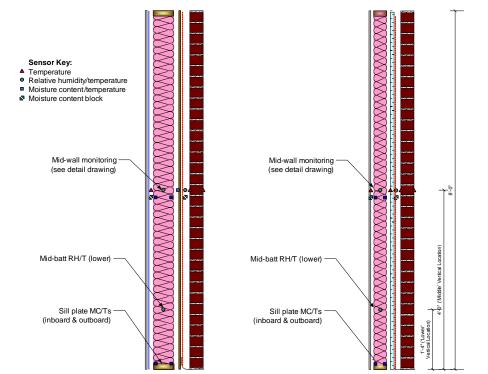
Section and monitoring layout for above grade walls 1 and 2 (left) and 3 (right)
